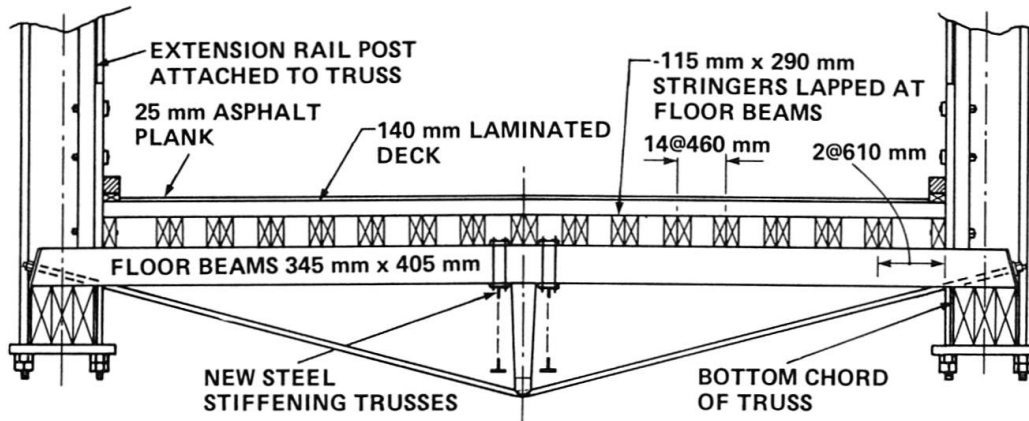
Cross Section of Truss Span at Sydney Creek Bridge.
